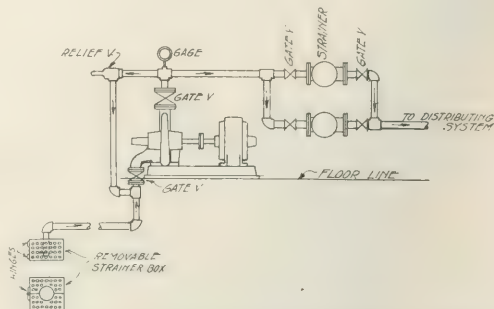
TYPICAL ARRANGEMENT WHERE WATER IS PUMPED
